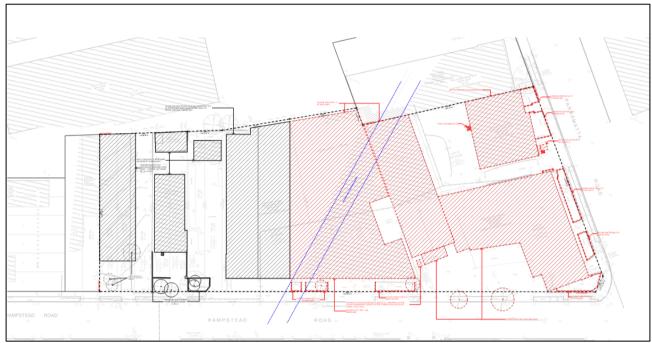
Demolition Plan extract (Source: Smith & Tzannes, 2022)
